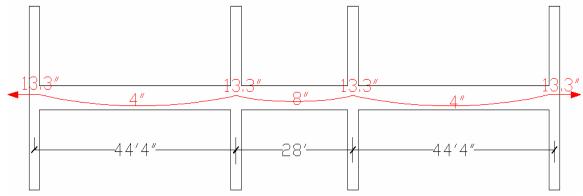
Tendon profile for typical beam in longitudinal direction. Drape dimensions are from bottom of concrete soffit.
